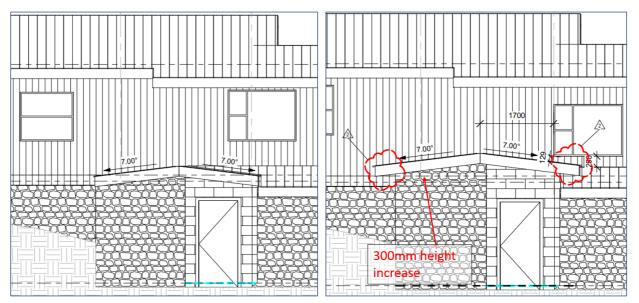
| Elevation plan identifying the 300mm increase in height of the entrance-way gable roof (Source: Applicant's Modification Application 2023)
